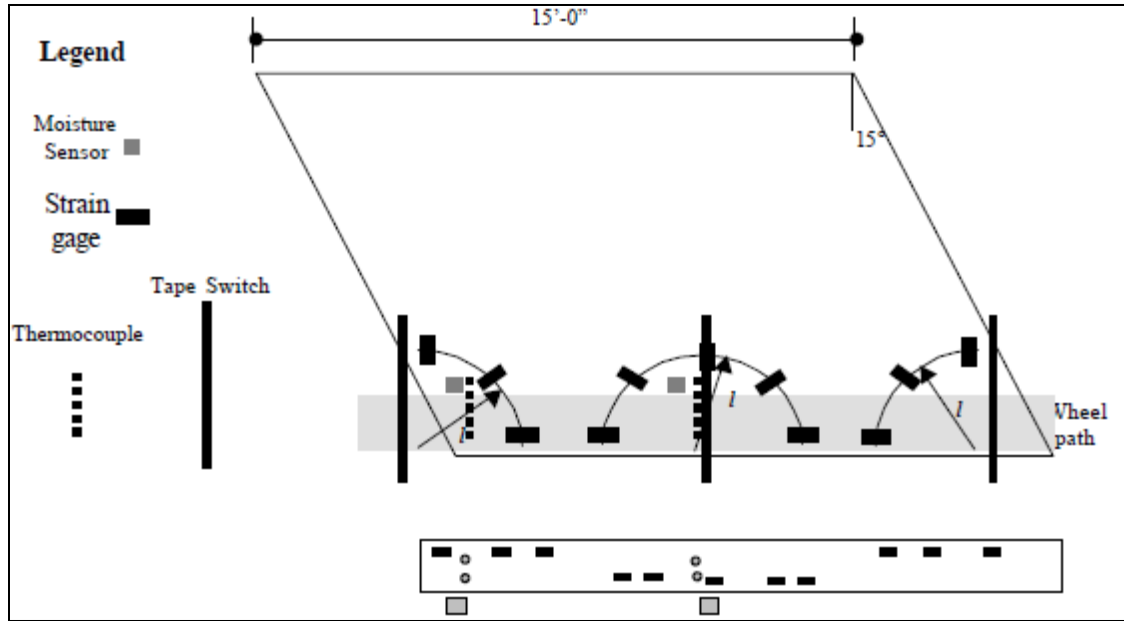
PCC Instrumentation Layout (Fanous, 1999)
